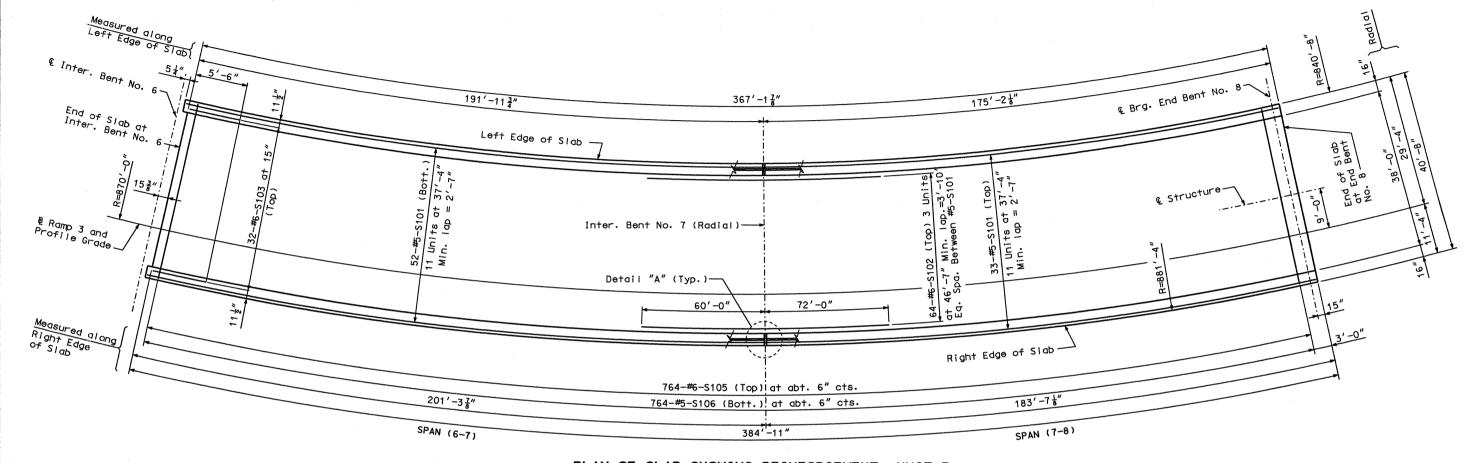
DETAILS OF SLAB REINFORCEMENT - UNIT 1
